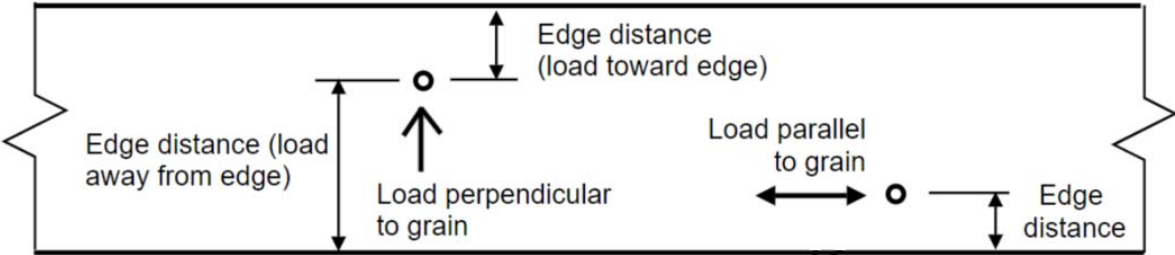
SPACING FOR SCREWS INSTALLED PERPENDICULAR TO THE GRAIN
